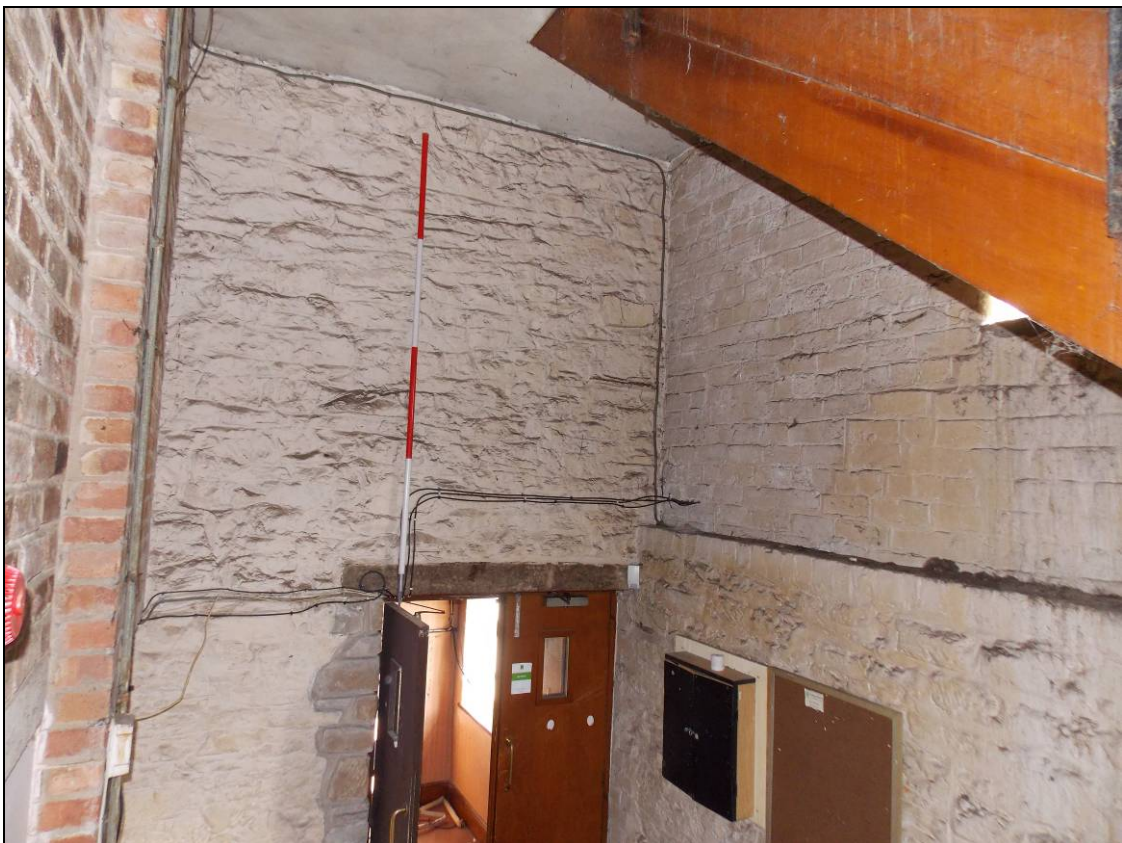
Stairwell within the first floor, looking north (scale 2m).
